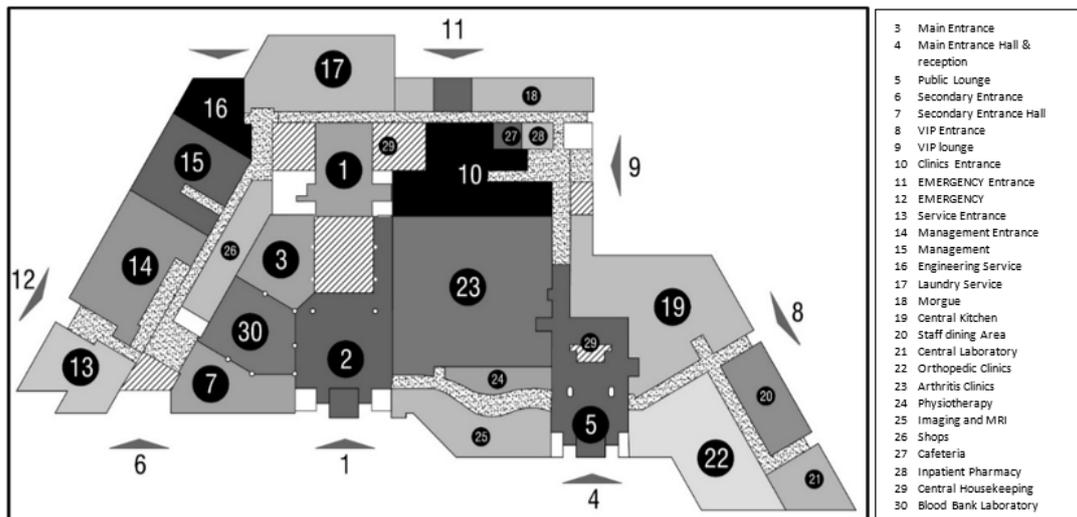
Faruk Medical City (FMC) ground floor plan (Researcher according to (about FMC, 2021).
